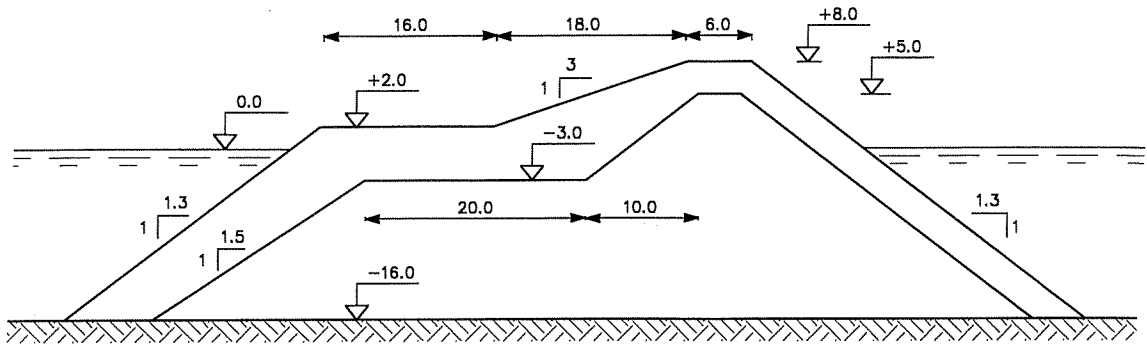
Typical cross-section for berm breakwater on Rennesøy. All measures are in m.
